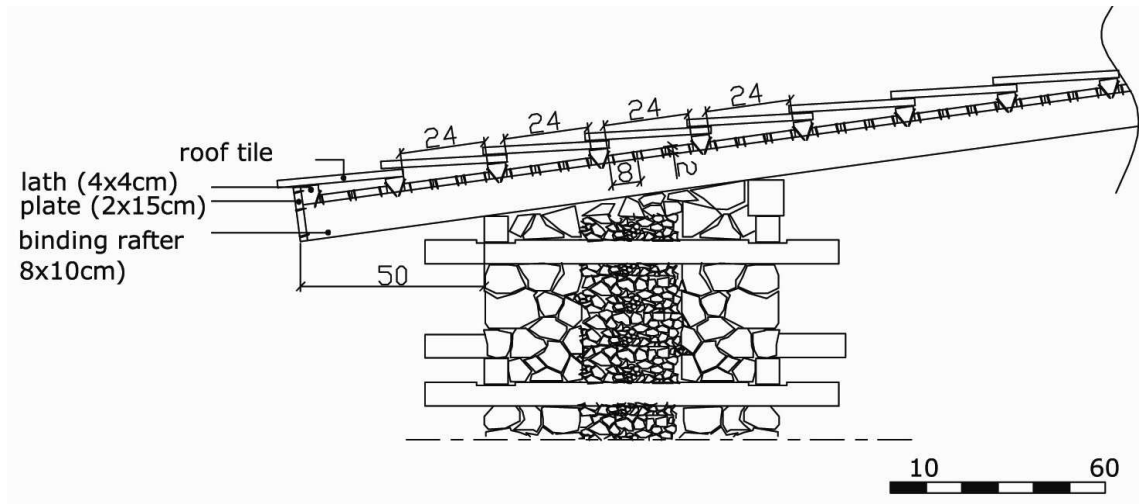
43 Drawing of the roof-masonry wall connection. Çelik 2008.
